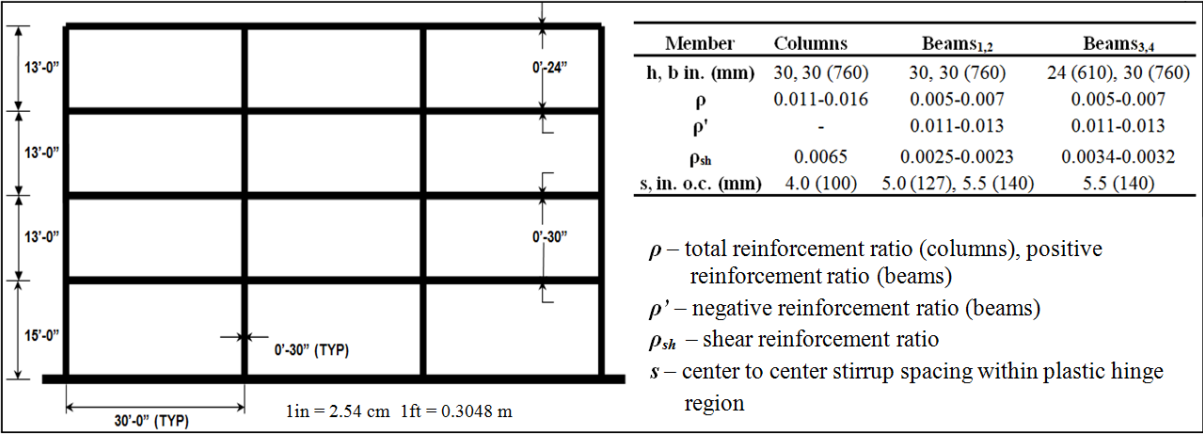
Elevation view of three bay representation of the four-storey space frame building with typical design details reported from Haselton and Deierlein (2007)
